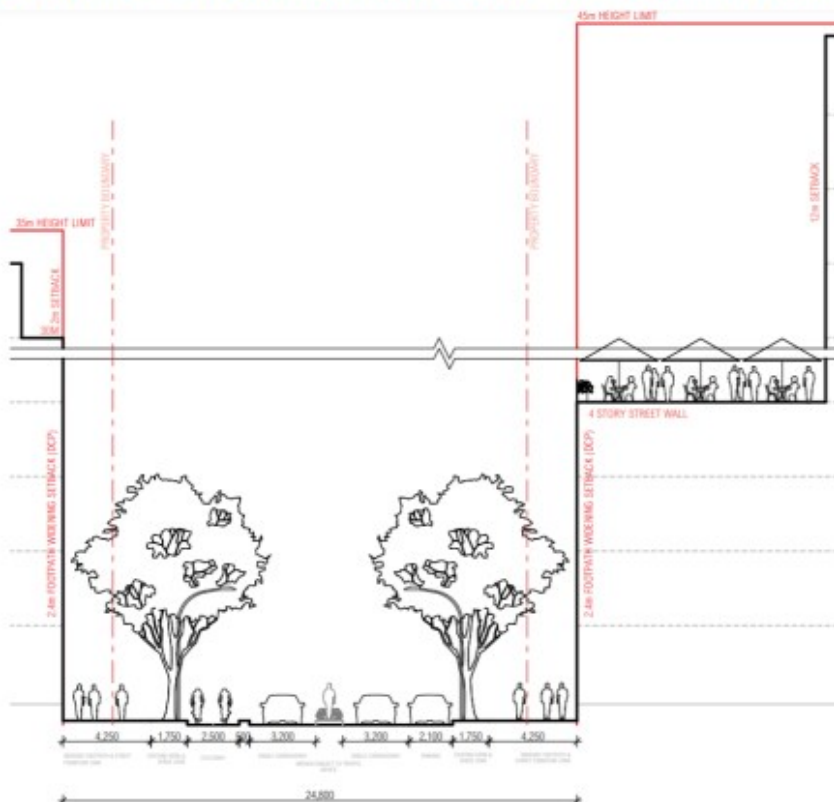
Indicative street section for Bourke Street, showing the 4 storey street wall behind the 2.4m footpath widening, and the 12m upper level setback behind (draft SDCP 2012 - Southern Enterprise Area)
